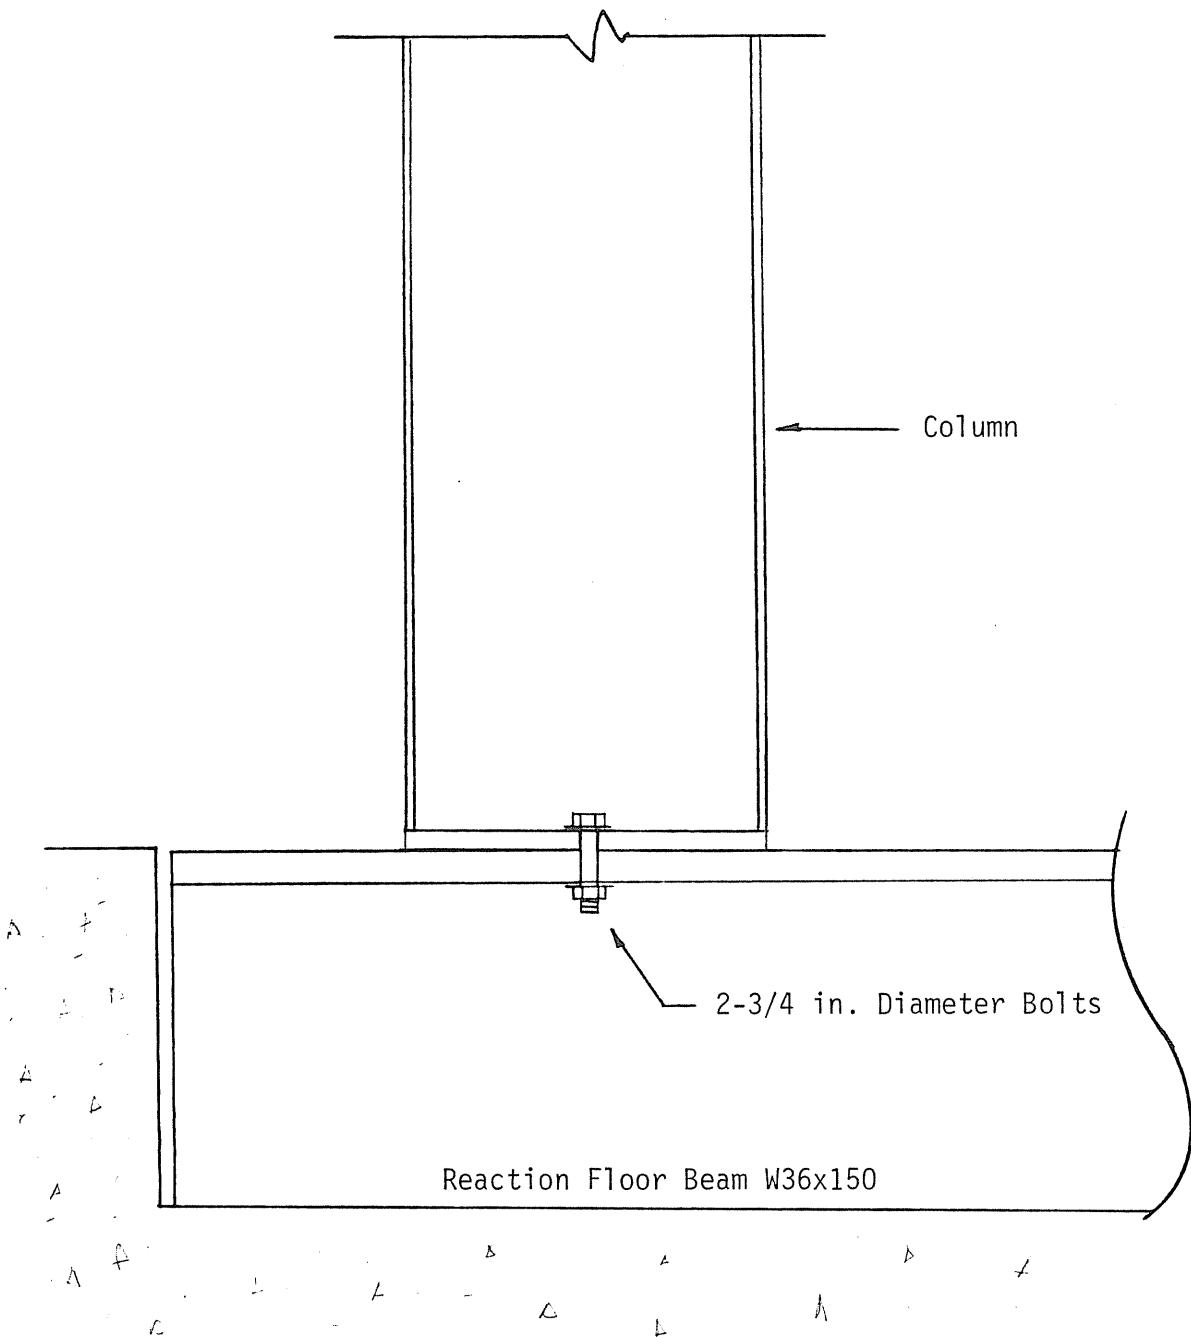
DETAILS OF COLUMN-TO-REACTION FLOOR CONNECTION
